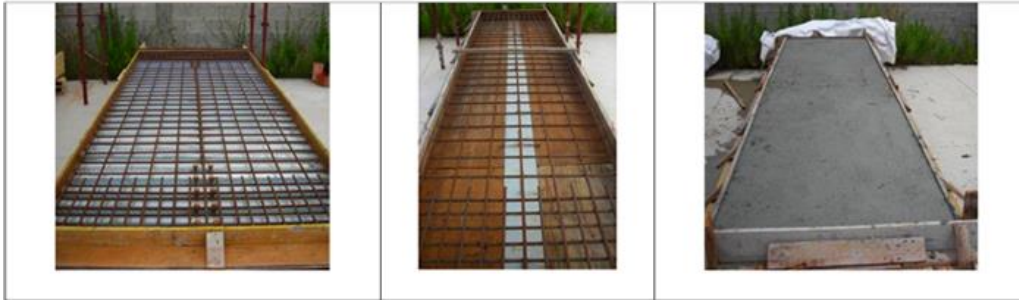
Tested beams: slab with (on the left) and without (center) profiled sheeting. Concrete cast of the slab (on the right).
